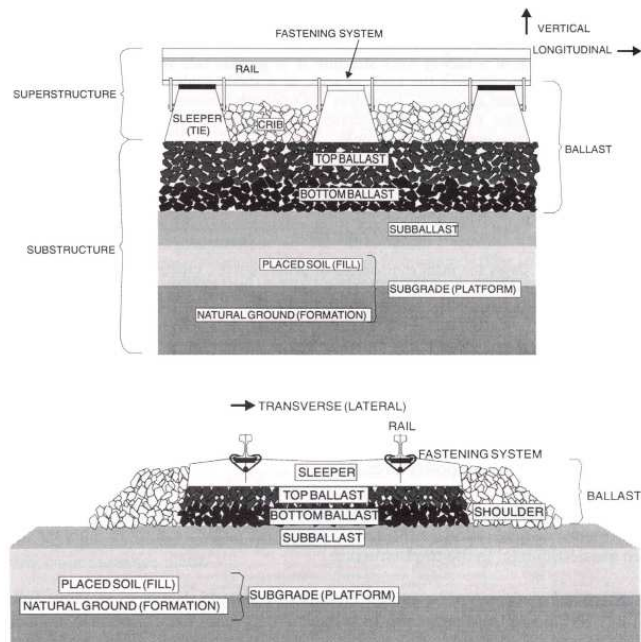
Ballasted railway track (Selig and Waters, 1994).
